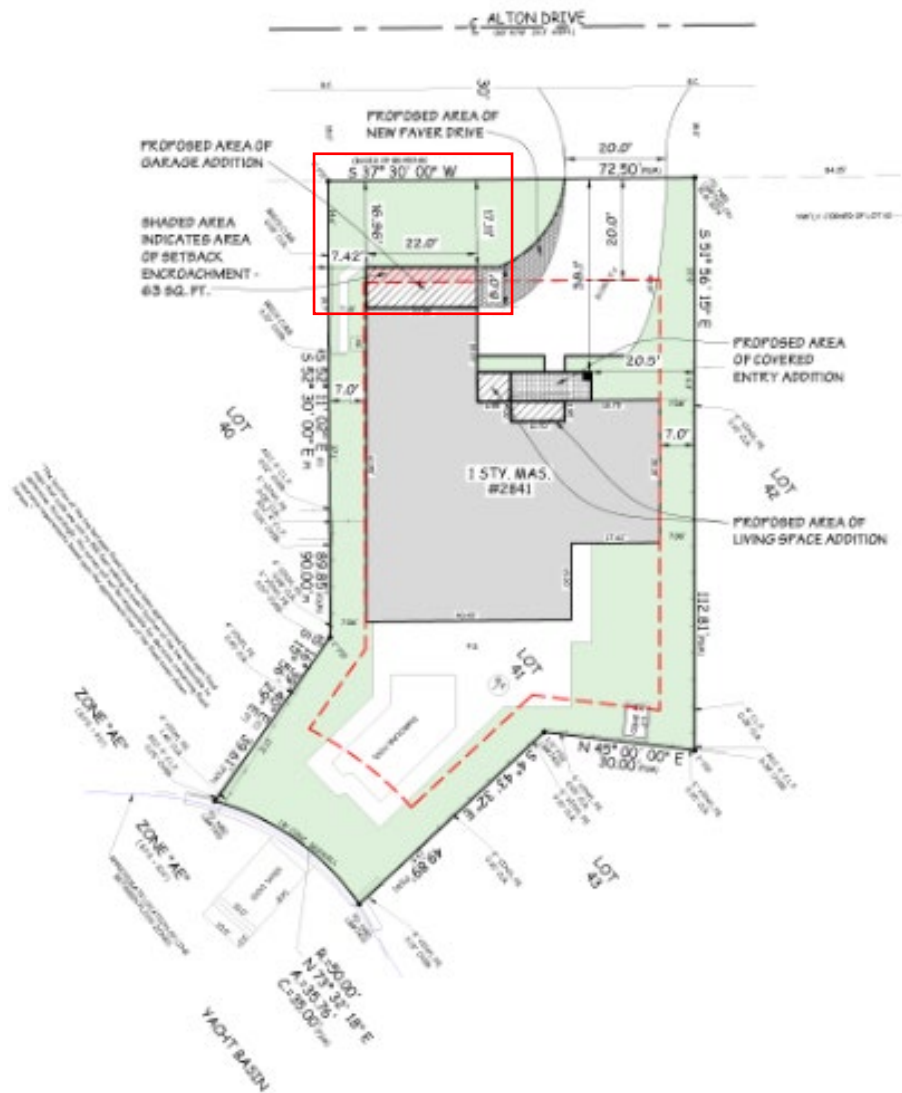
Site Plan with Proposed Attached Garage (N.T.S.)
